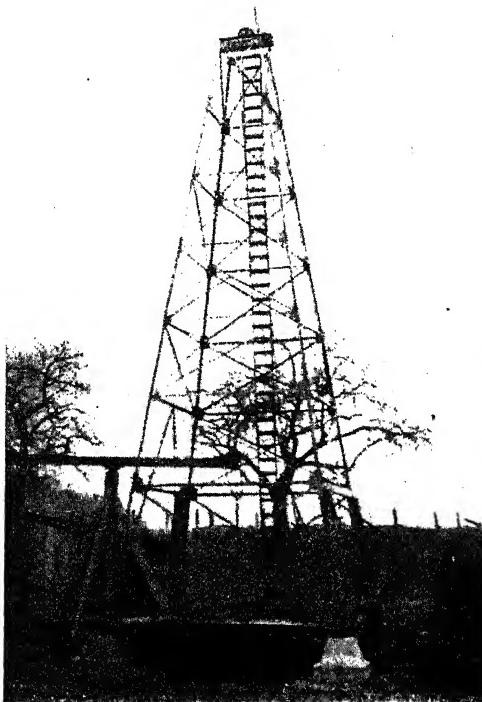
55-FT. SHORT-PANEL STEEL DERRICK, 1909. CARTER OIL CO., SISTERSVILLE, W. VA.
